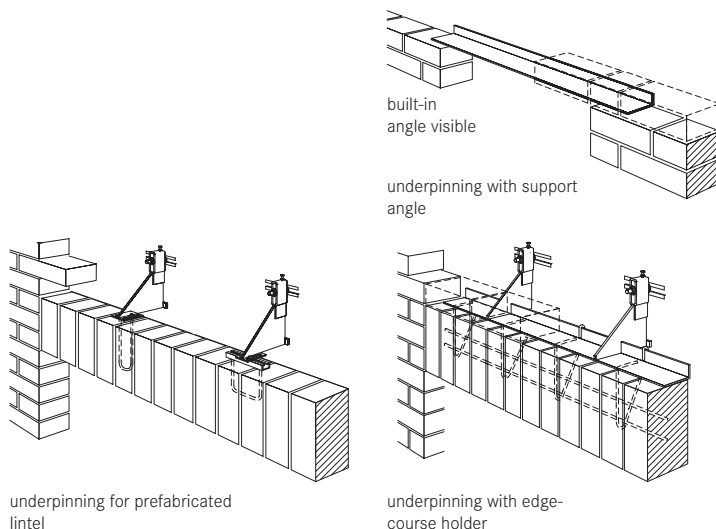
Underpinning over wall apertures in twin-leaf masonry
